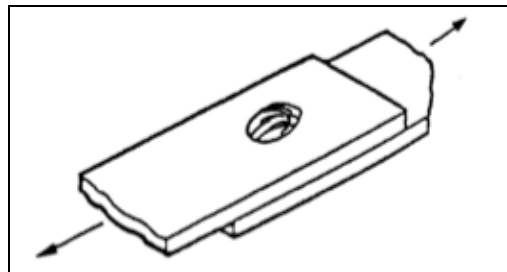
Bearing Failure of the Plates [9]
